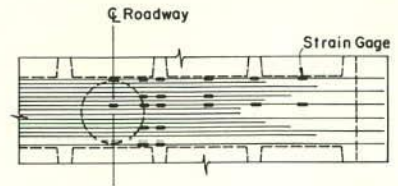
Strain Gages on Bent Cap Reinforcement for Single-Column Model Bridges
